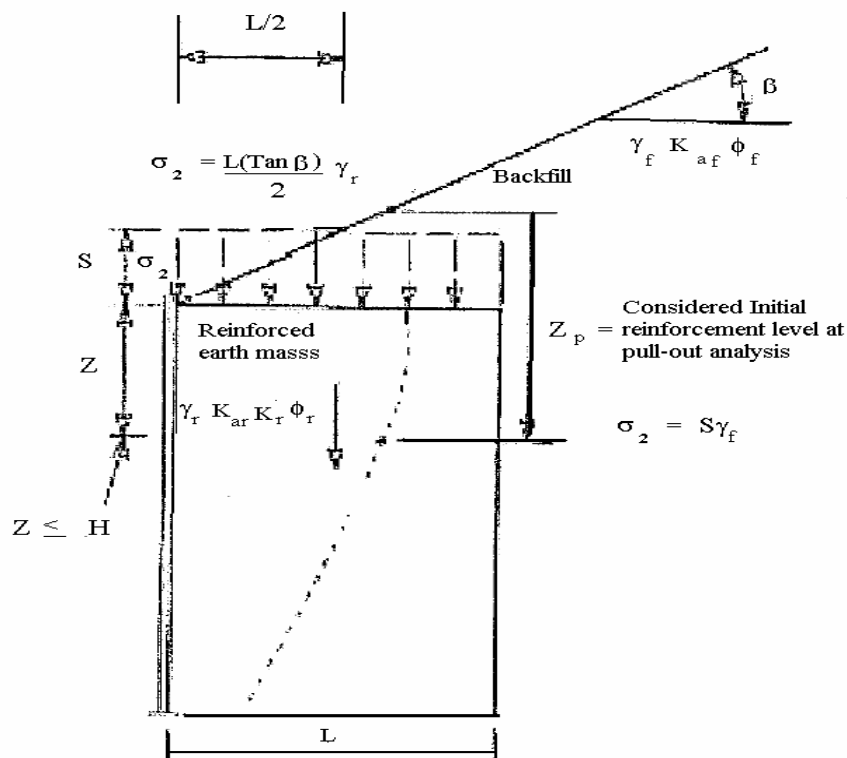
Calculation of lateral stress in case of sloped backfill
